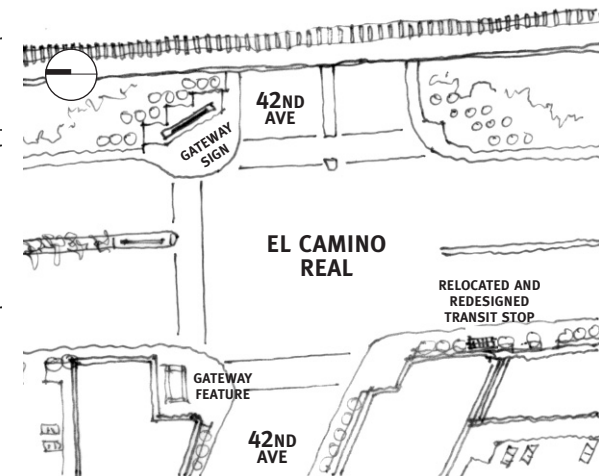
Potential private redevelopment at the 42nd Avenue intersection, including additional sidewalk width, landscape setbacks, expanded corner plazas, redesigned transit stops and an entry sign.
